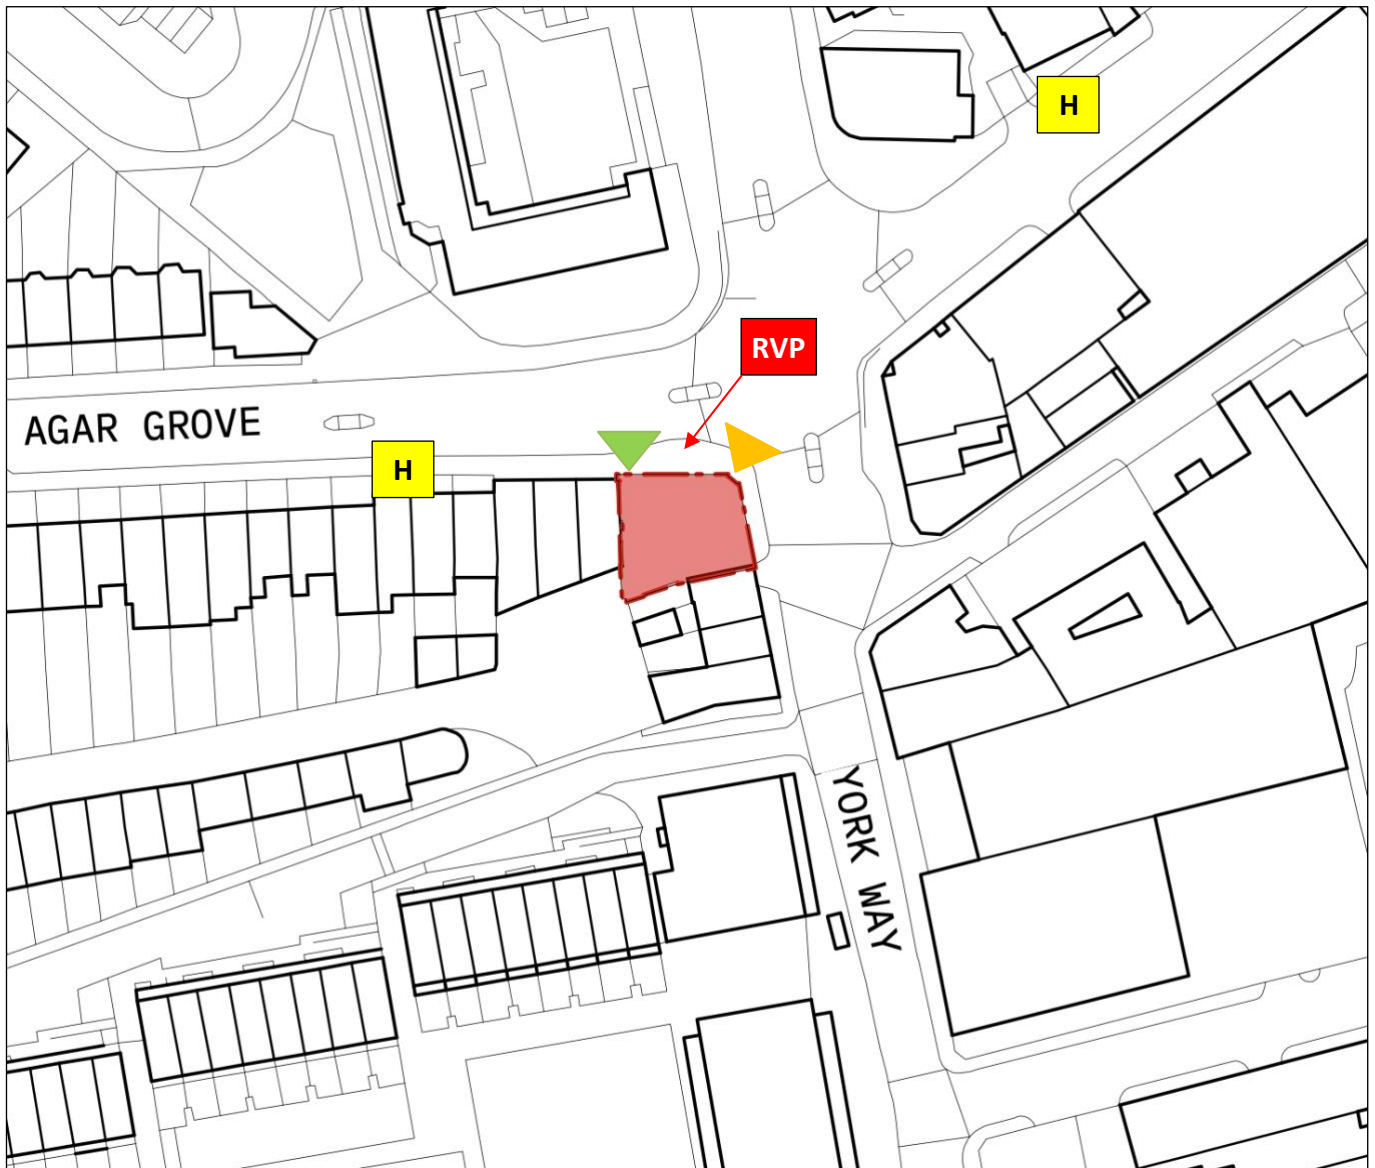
Site Plan showing the footprint of the site in red, the likely FRS RVP, the residential entrance (green) and PH entrance (amber) and the location of the nearest public hydrants (H – denotes single hydrant).
